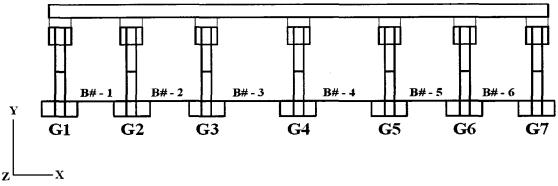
Models Used for Bridge Analysis – Seven Girders Model
